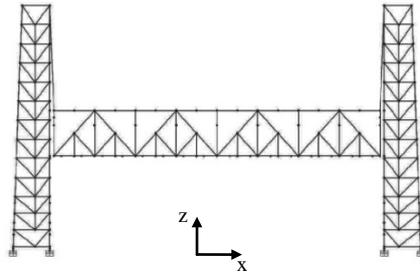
Schematic Elevation View of Fruitvale Ave Bridge, at Mid-Level Position
